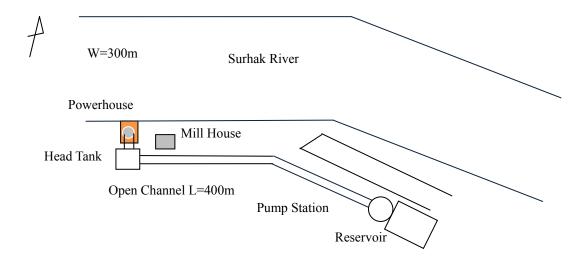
Power Facility Plan at Surhak-1 Site
